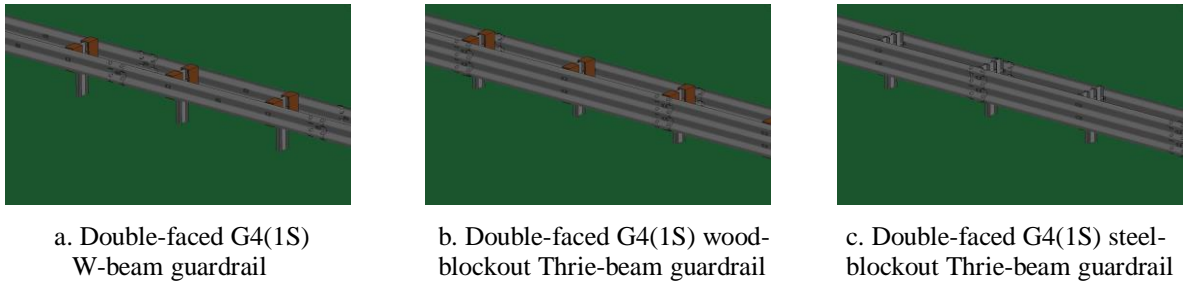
FE models of a double-faced G4(1S) W-beam guardrail, double-faced wood-blockout Thrie-beam guardrail, double-faced G4(1S) steel-blockout Thrie-beam guardrail.
